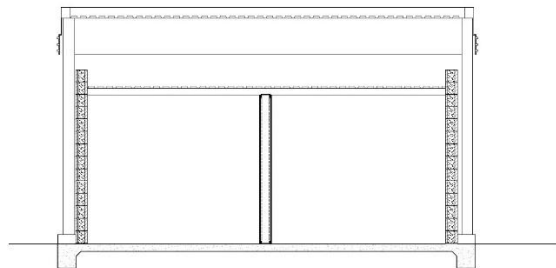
BUILDING A, WEST ELEVATION (EXISTING AND PROPOSED)
